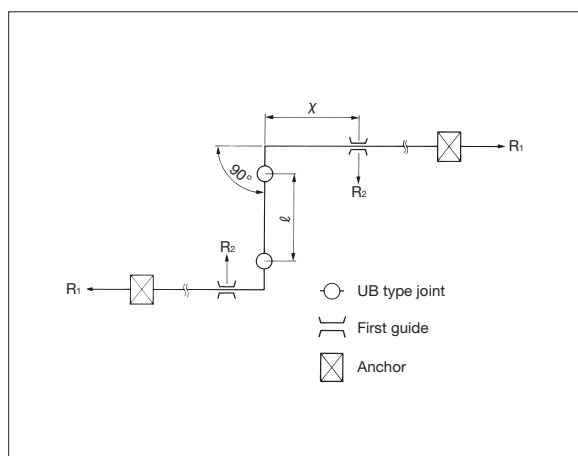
Connection of the UB type joints, anchoring points and guides (1)
